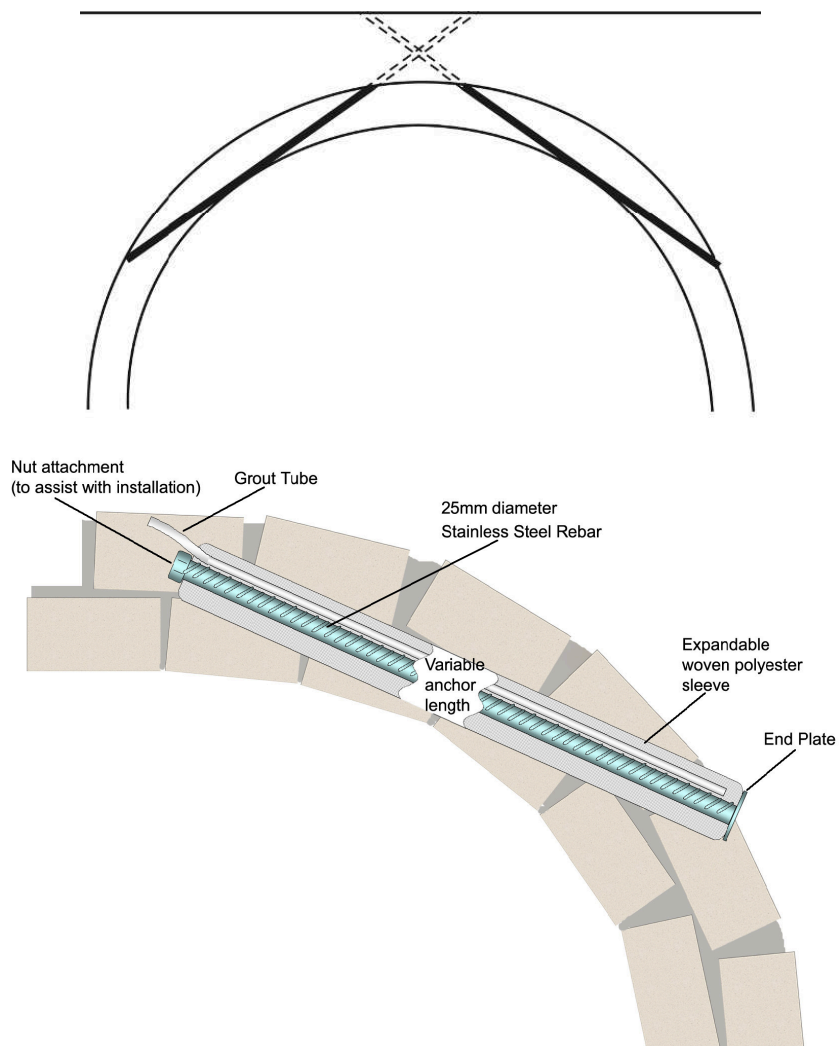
Typical position of bars in internal reinforcement (above) and the Cintec Anchor; taken from [Mullet et al., 2006] (below).
